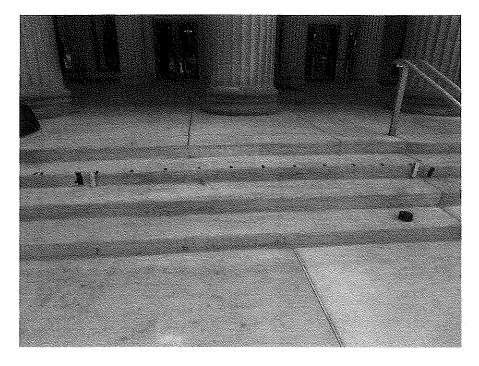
Overall photo at north section Stairway A, measurements last 10 feet at third riser
